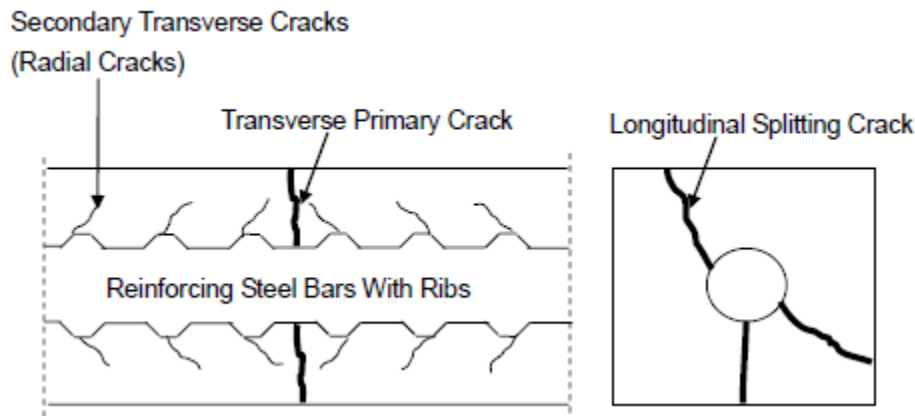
Cracks formed in reinforced concrete beams (Tassios, 1979; CEB Bulletin No. 151, 1982)
